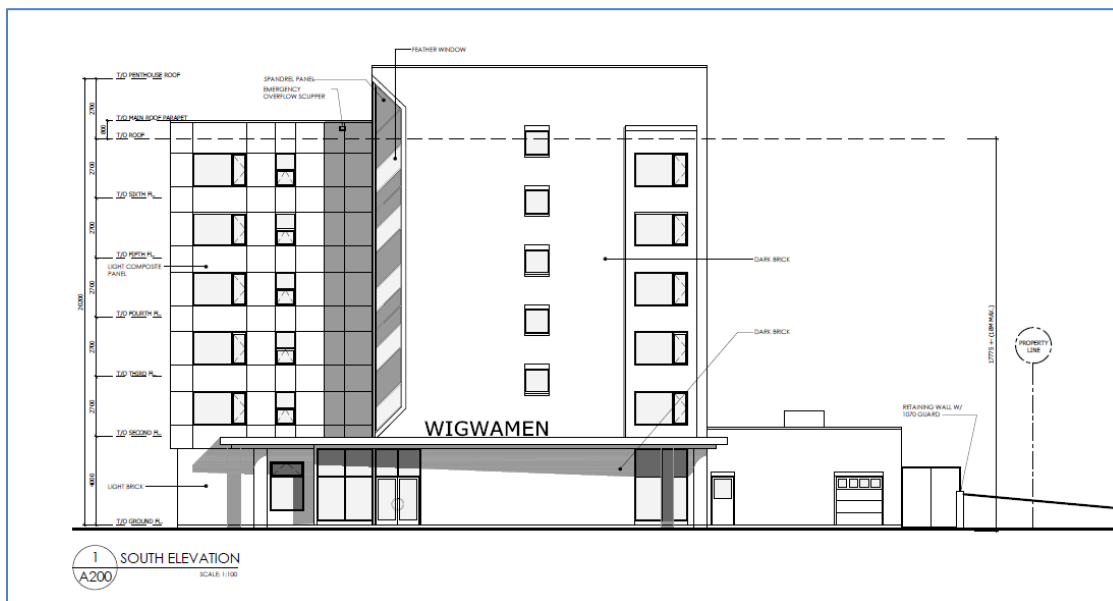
South Elevation of 6-storey mixed use building, which will front onto the private way (Sutton Place). The primary entrance for the rental apartments will be off the private way. Source Elevations, Drawing A200, prepared by Vandenberg and Wildeboer Architects, dated December 20, 2022.
